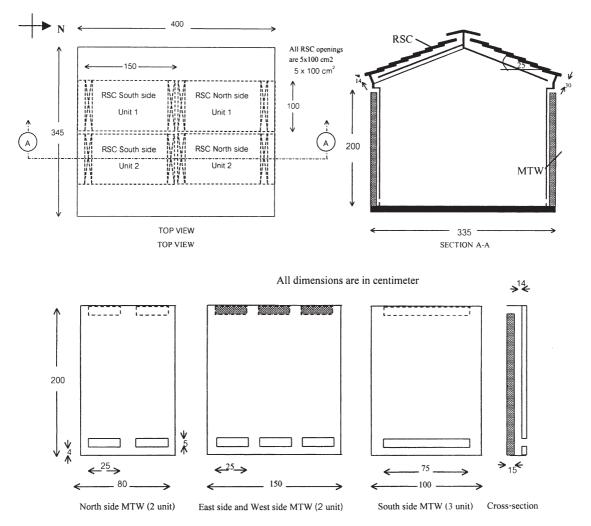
Dimensions of roof solar collector and modified trombe wall (not to scale).
